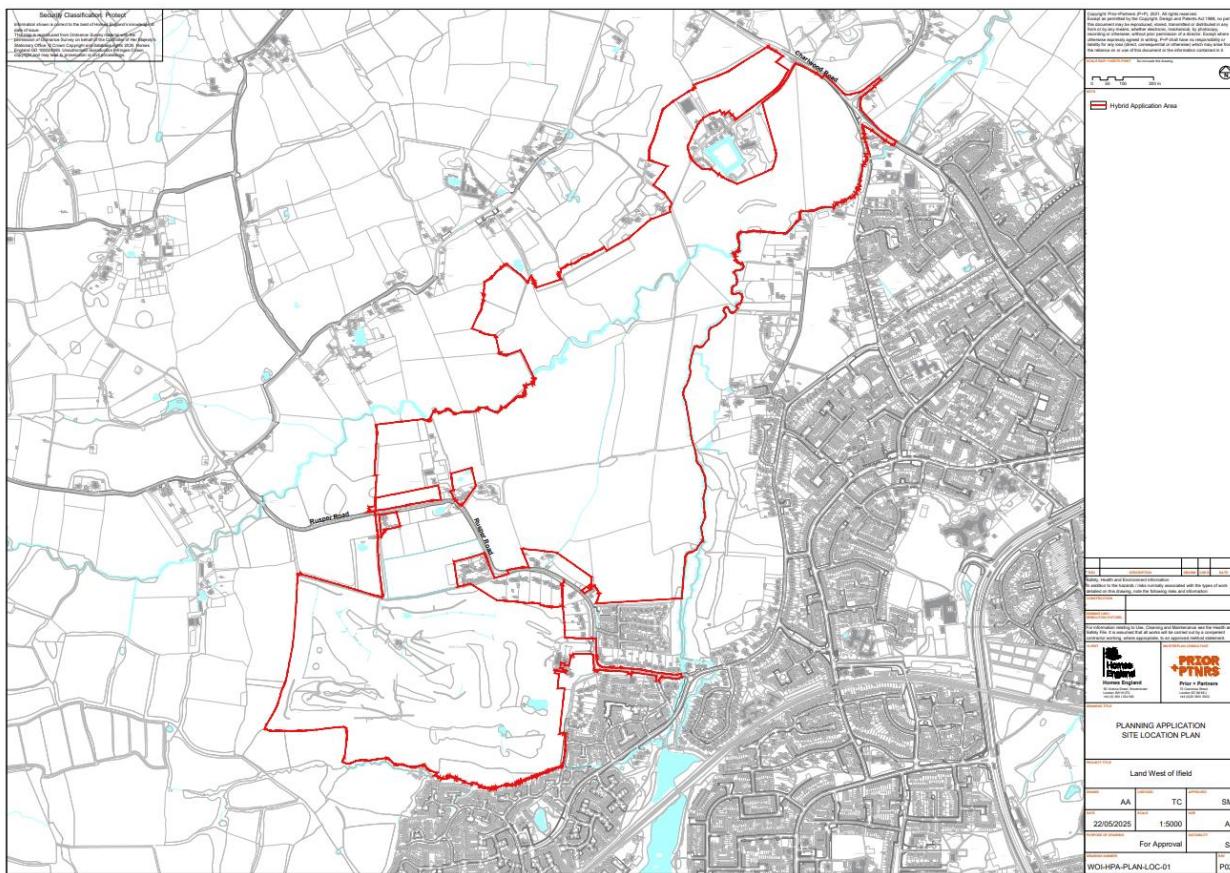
Site Location Plan (WOI-HPA-PLAN-LOC-01)
